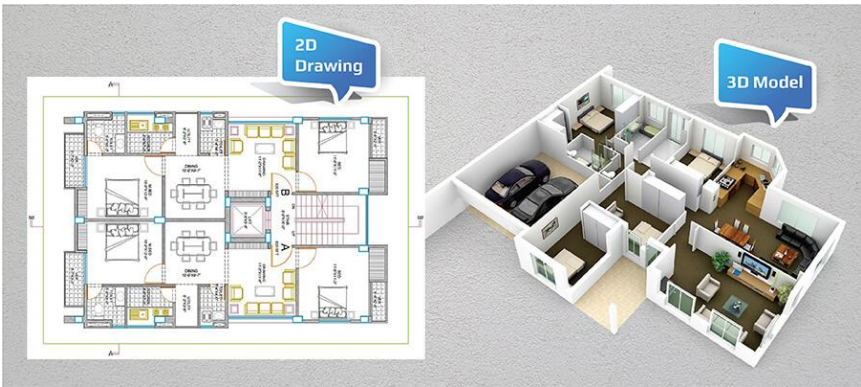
2D Floor Plan and 3D Floor Plan Visualization
